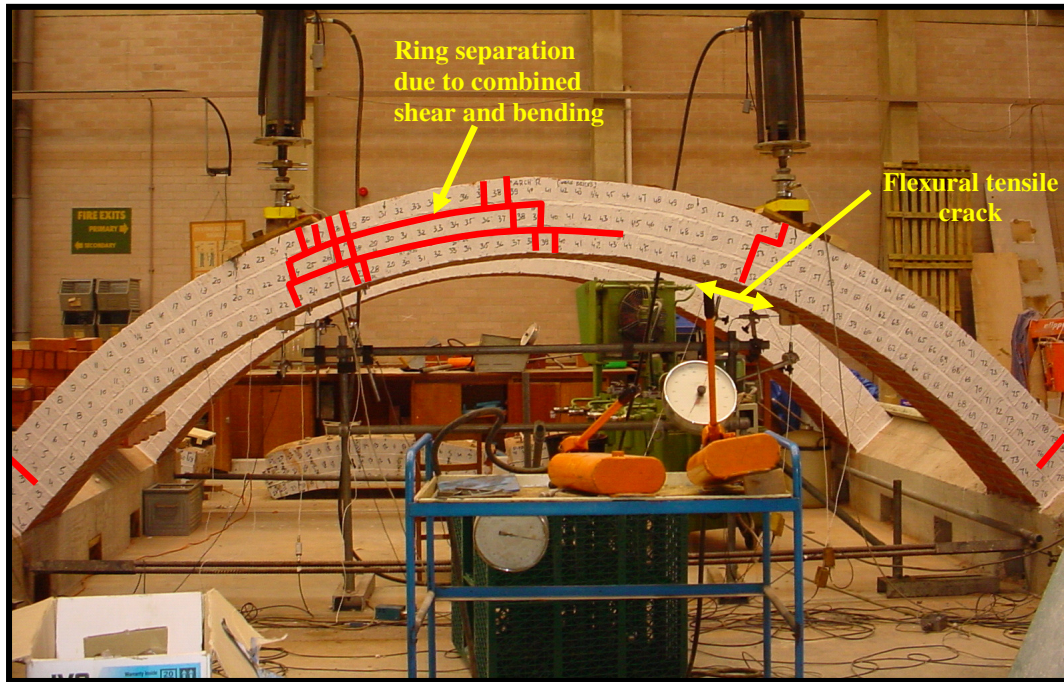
Crack patterns and failure modes for an arch constructed with brickwork (Melbourne and Tomor, 2005)
